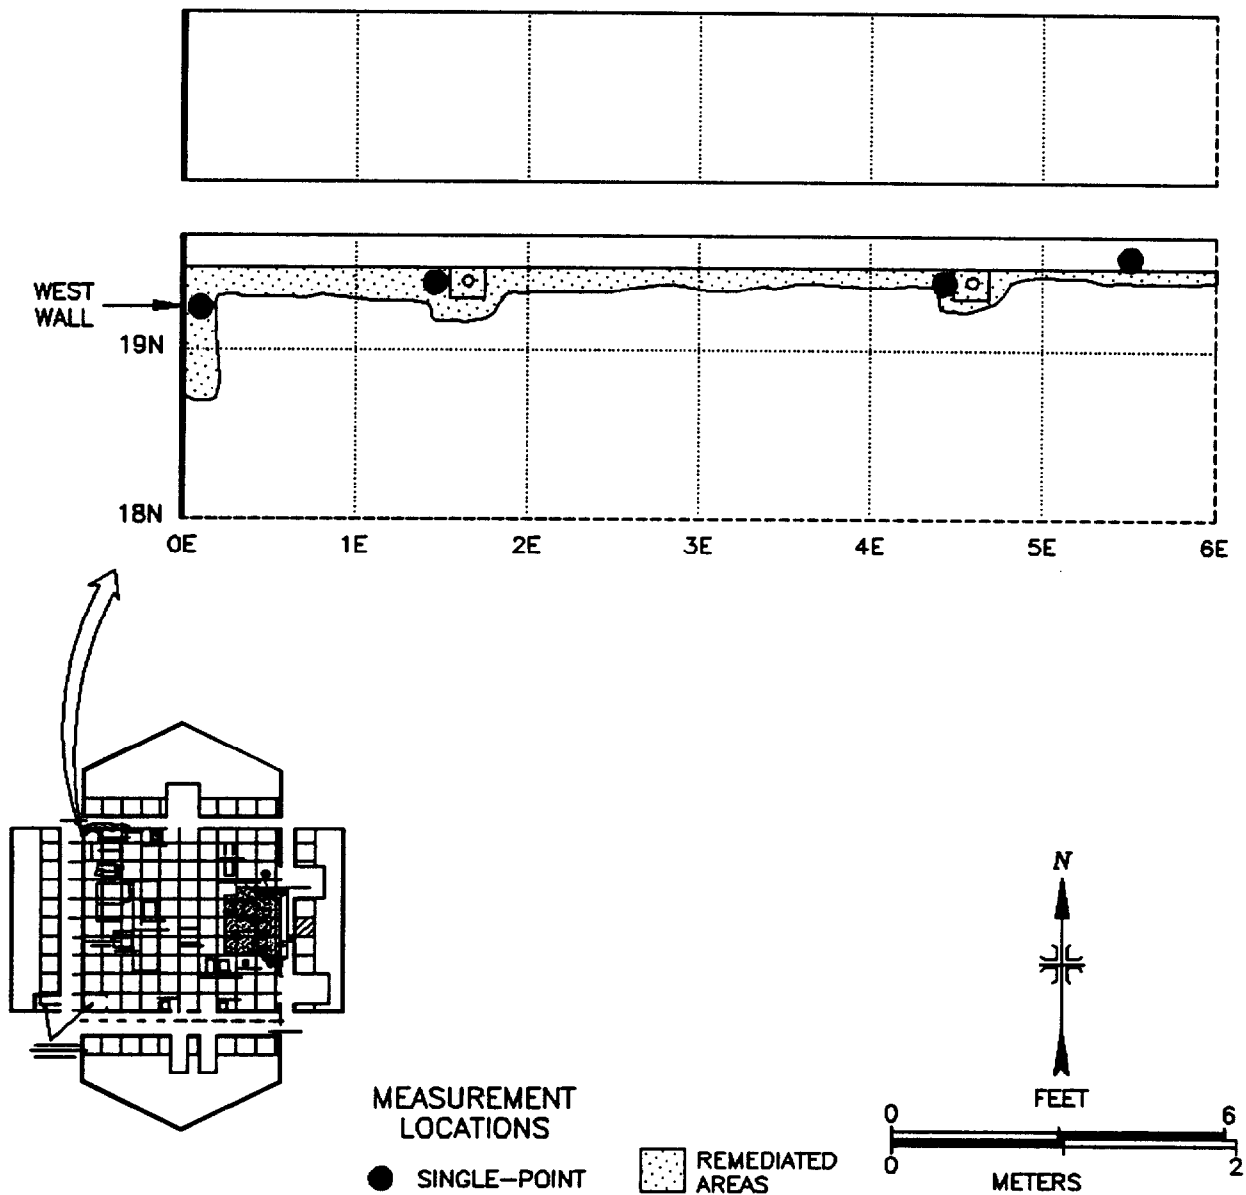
Building 30, Fabrication Room, North Wall Floor and Drains - Remediation Areas and Measurement Locations
